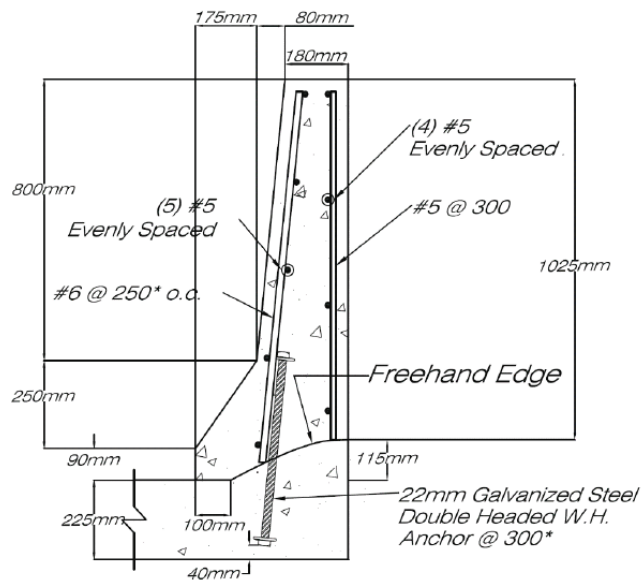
Clark's Mill Bridge traffic barrier [19]
